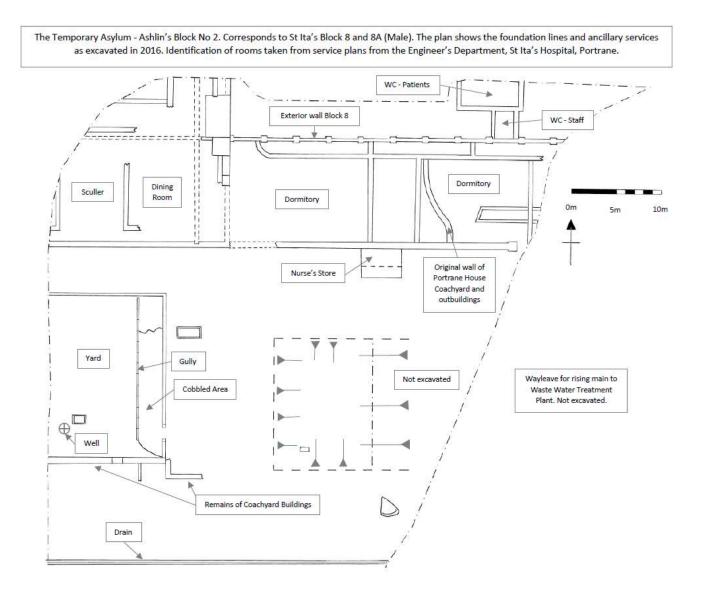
Area 1. Ashlin's building No 2 / Block 8/8a and the Portrane House yards as excavated (2016)
